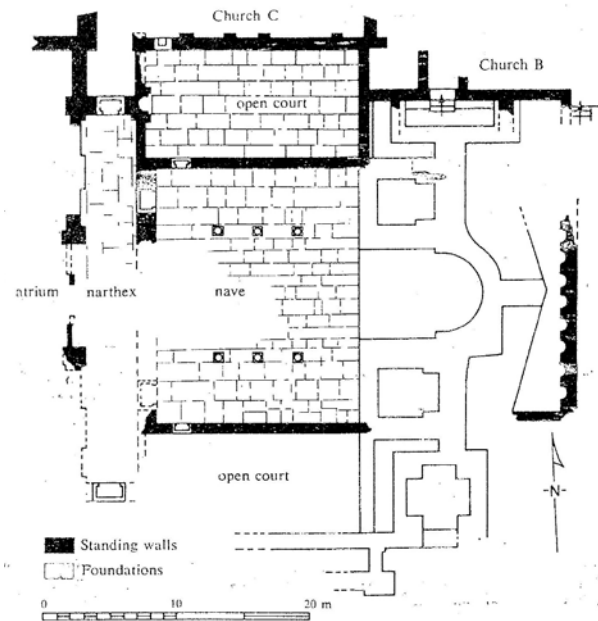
Plan of the Beyazit Basilica A in Constantinople
